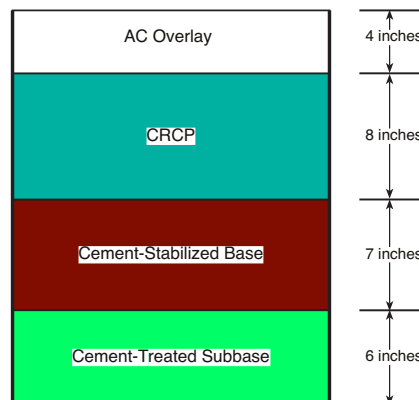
Cross-section of the pavement on IH 20 in Harrison County
